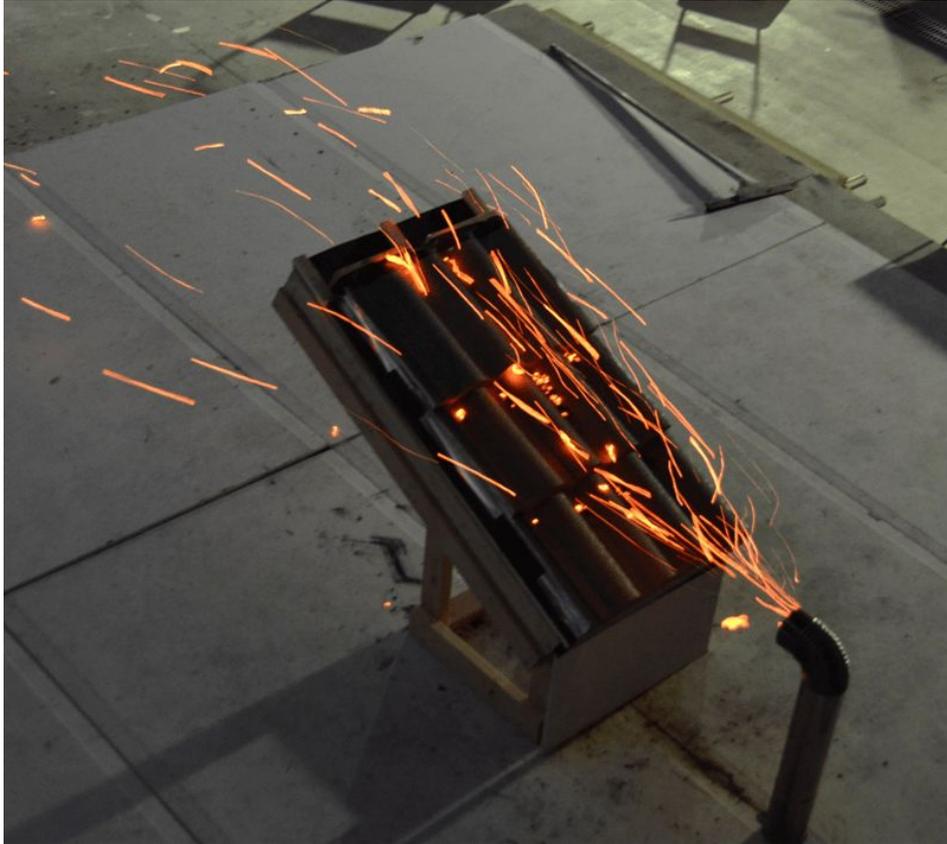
The NIST Dragoon firebrand shower at 6 m/s attacking concrete roof tiles in a test conducted to show how firebrands slip under roofing tiles [a]
